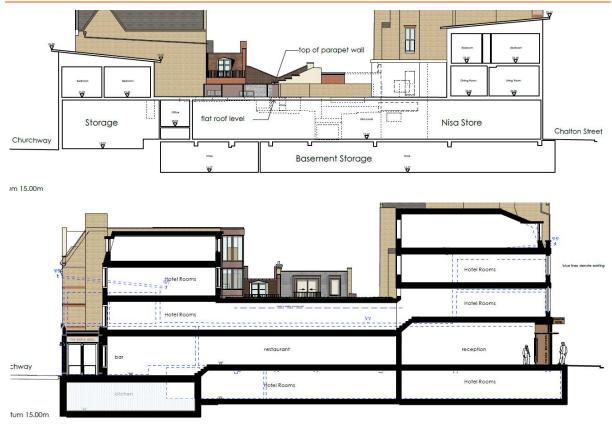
Cross section A-A' through 53-55 Chalton Street and 60 Churchway
